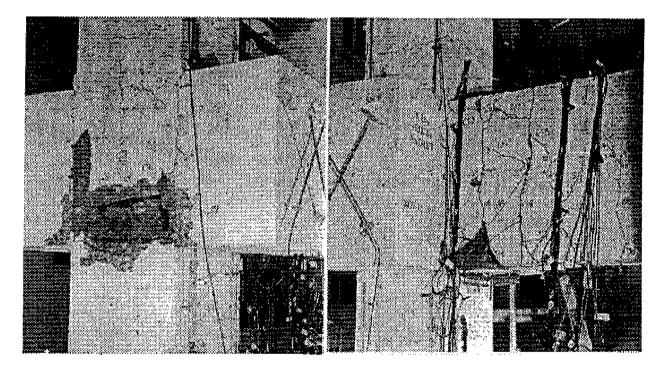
Push-out of Heads on Bottom Beam Bars Fig. 10 Observed Beam Damage
